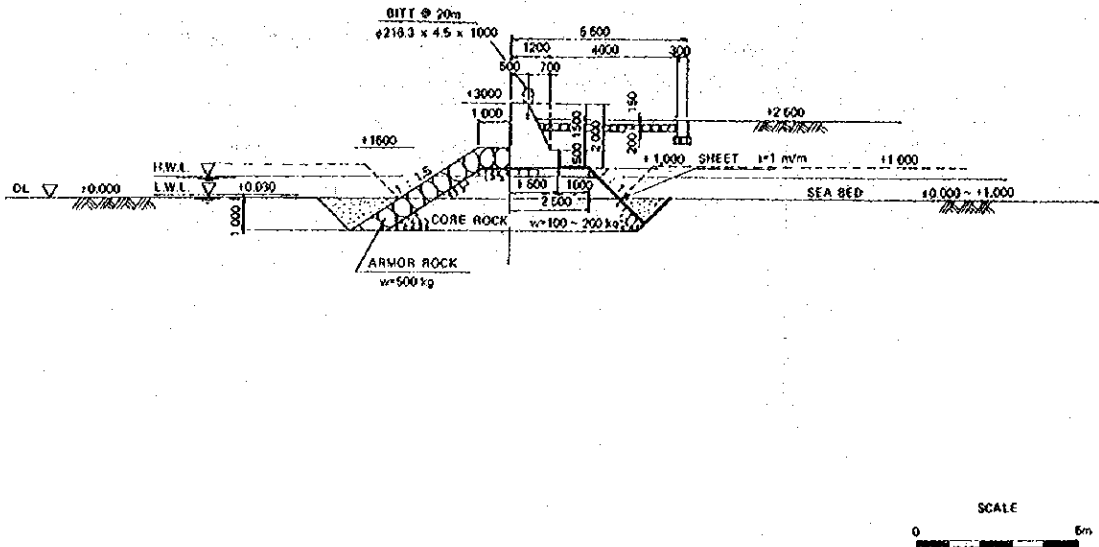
Cross Section of Rock Bulkhead (1) – Zamboanga Port
